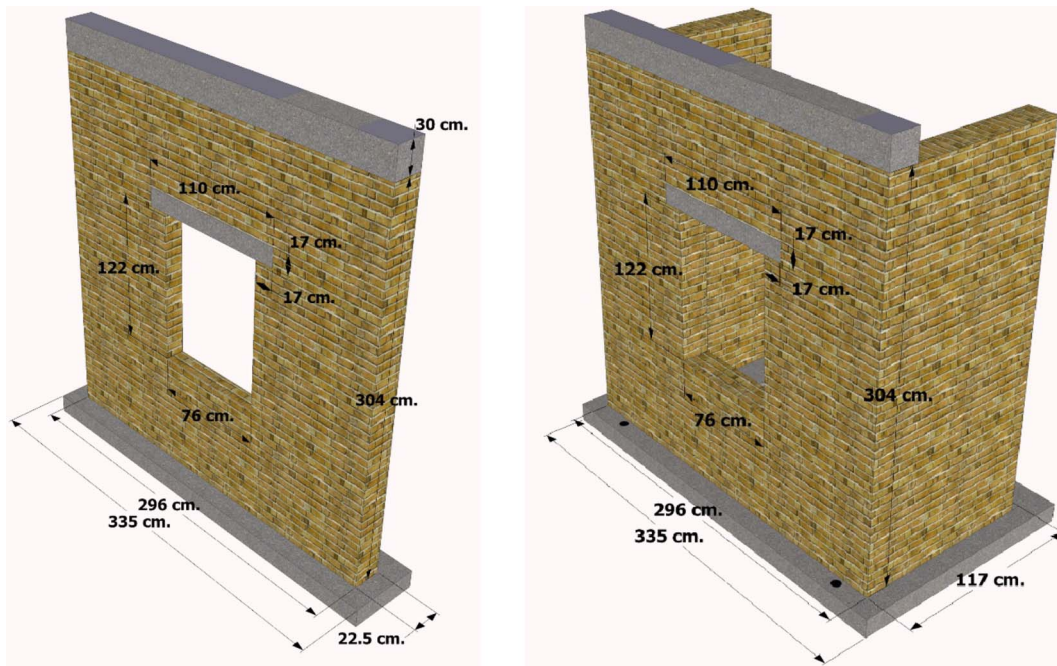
Geometric detailing of specimen S1, SF1 (isolated masonry wall) and S2, SF2 (flanged masonry wall).
